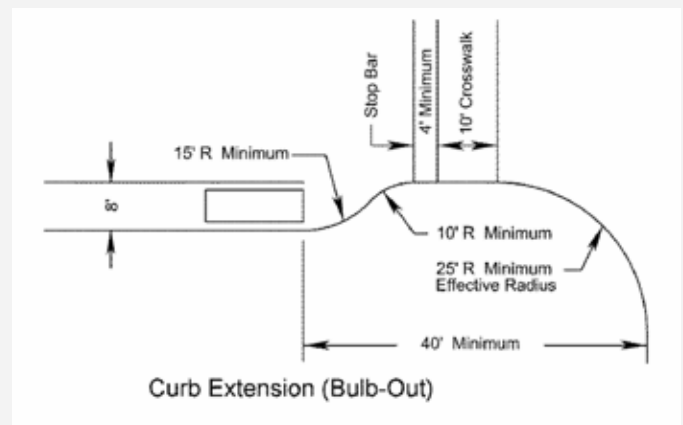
VDOT Curb Extension Design Requirements. Image Source: VDOT Road Design Manual Appendix B(1).
